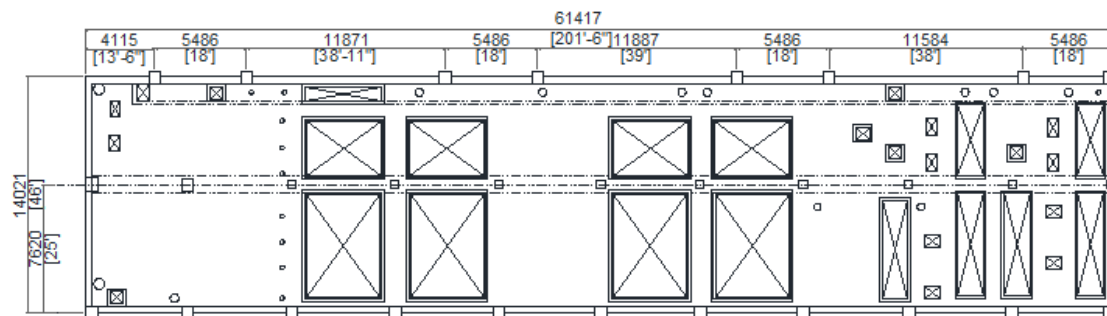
Typical top slab plan of the sulfur storage structure (sulfur pit)
